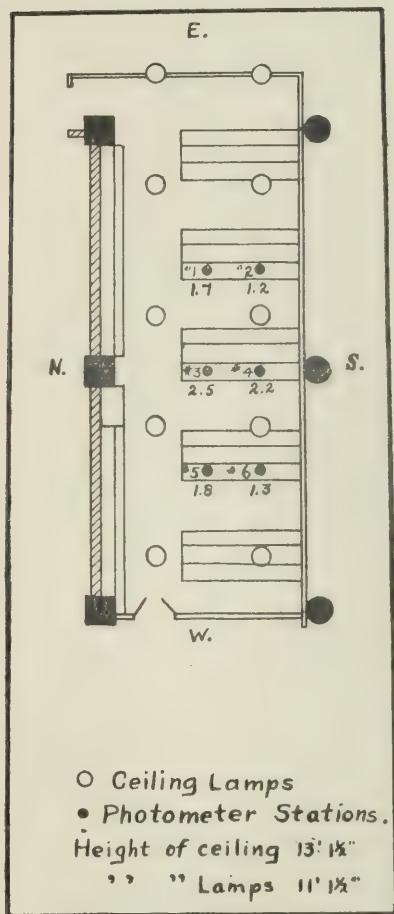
Section plan of fourth floor, (packing department), showing location of furniture, pillars, lighting units, test stations and illumination data.
